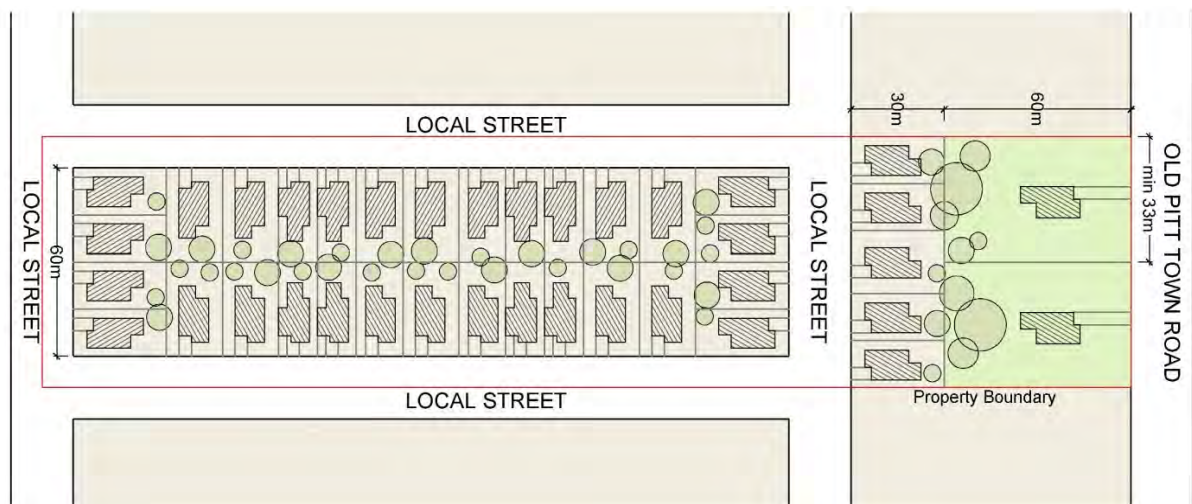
Indicative subdivision layout for residential development within an existing lot fronting Old Pitt Town Road
